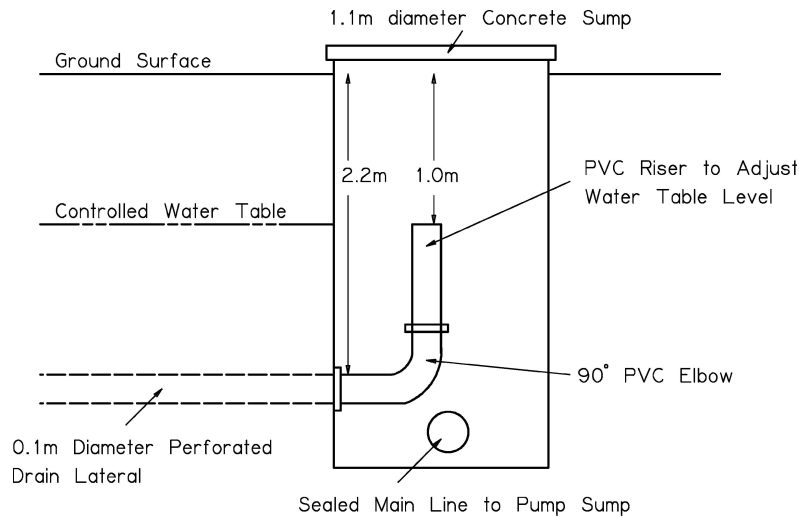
Cross-section of inspection sump with pipe riser on lateral drain.
